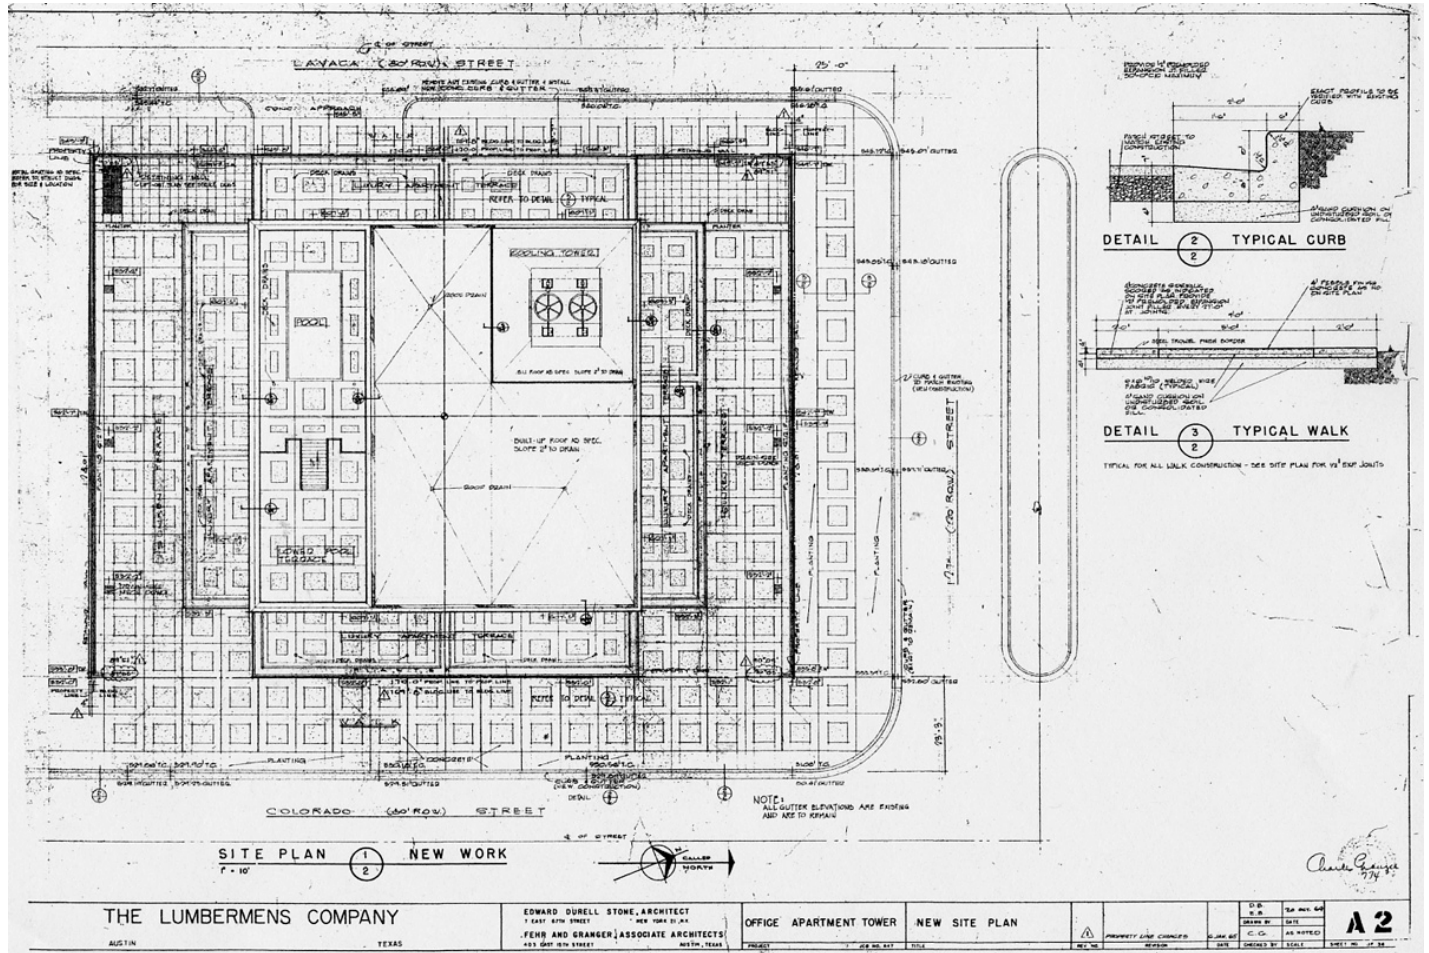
Site plan for the Westgate Tower, showing the patterned concrete at grade and at the Level 10 terraces.
